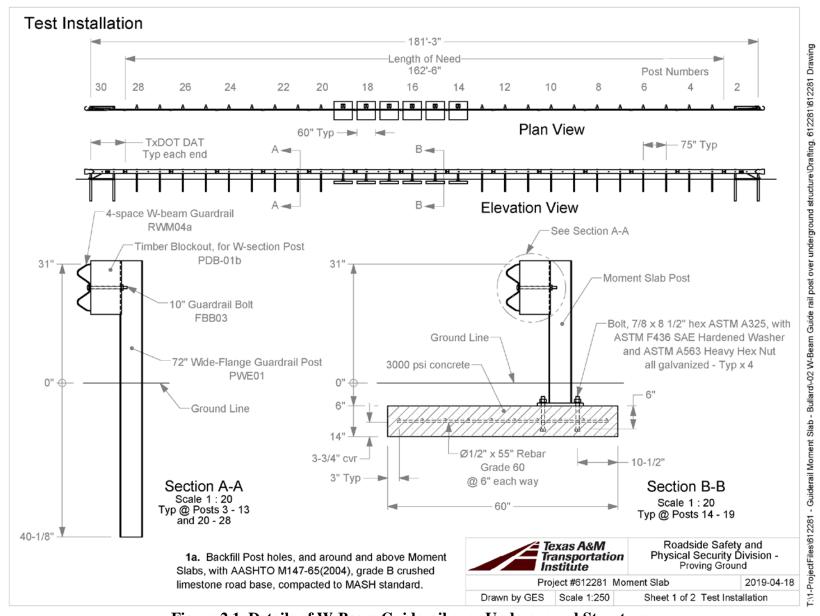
Details of W-Beam Guiderail over Underground Structure.
